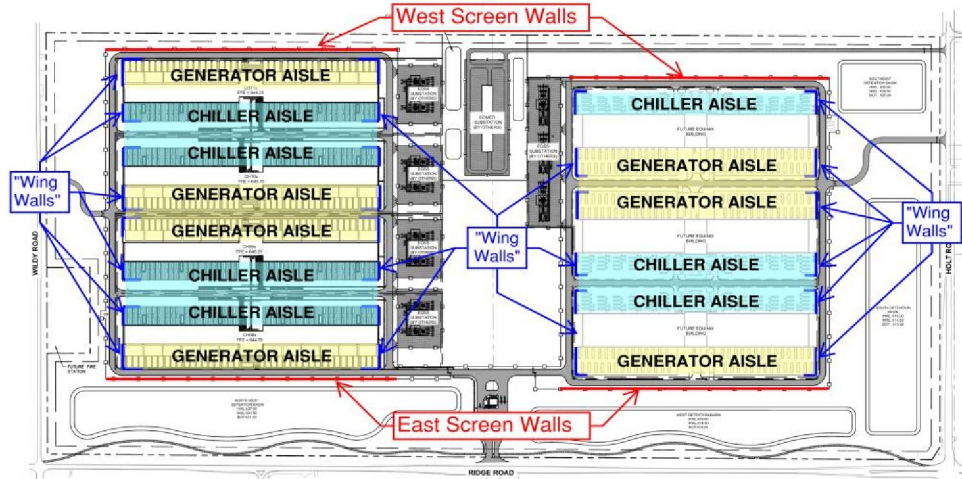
Site Plan Shown Screen Walls and Equipment Aisles
